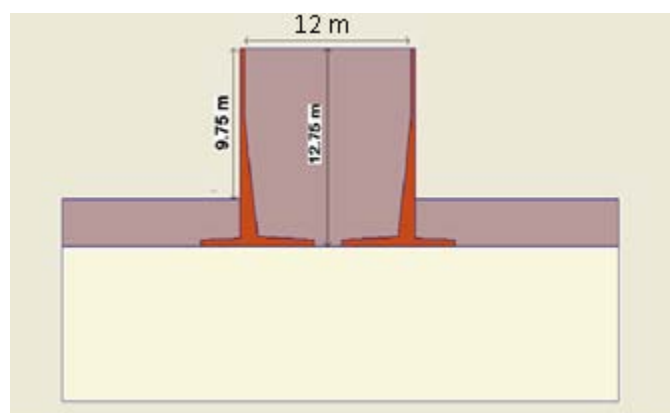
Embankment Section with 9.75 m unsupported height and 12 m top width
